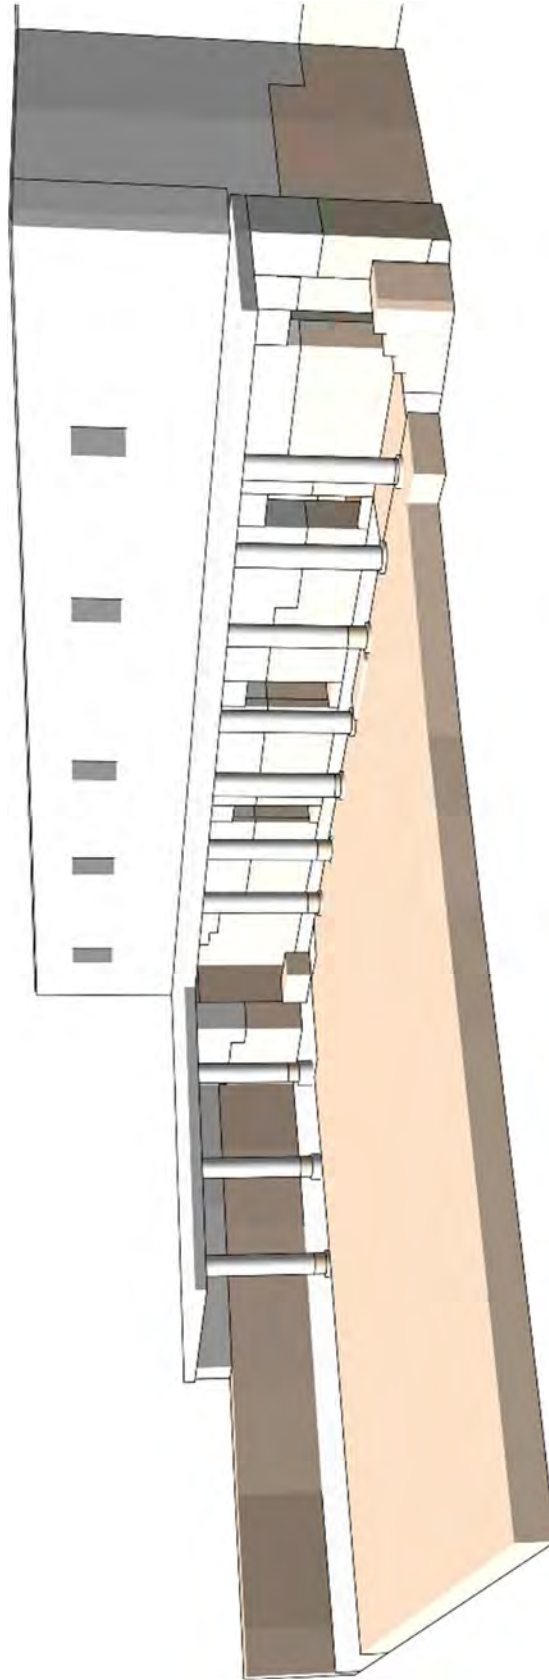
E/W architectural section from the cardo to building A (arch. E. Devaux and A. Mourneh).
